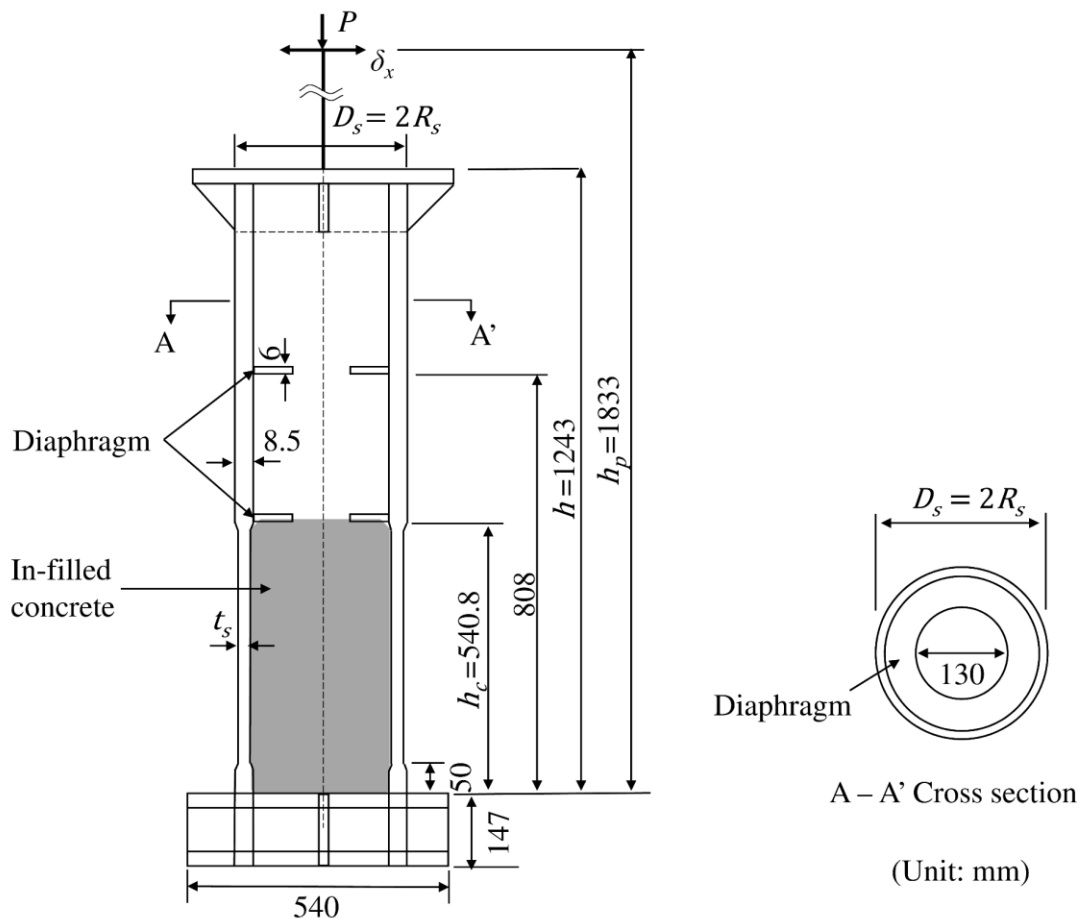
Single PCFT column specimen used in cyclic loading test
